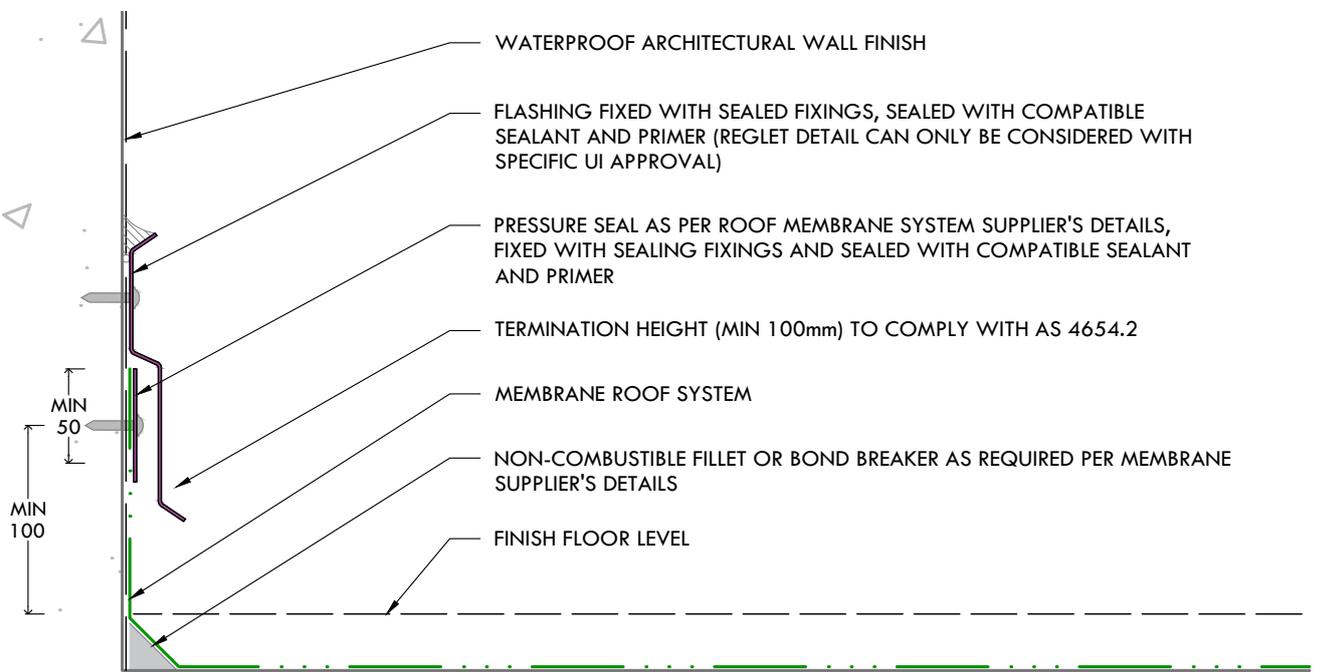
MEMBRANE ROOF TERMINATION AT VERTICAL WALL
